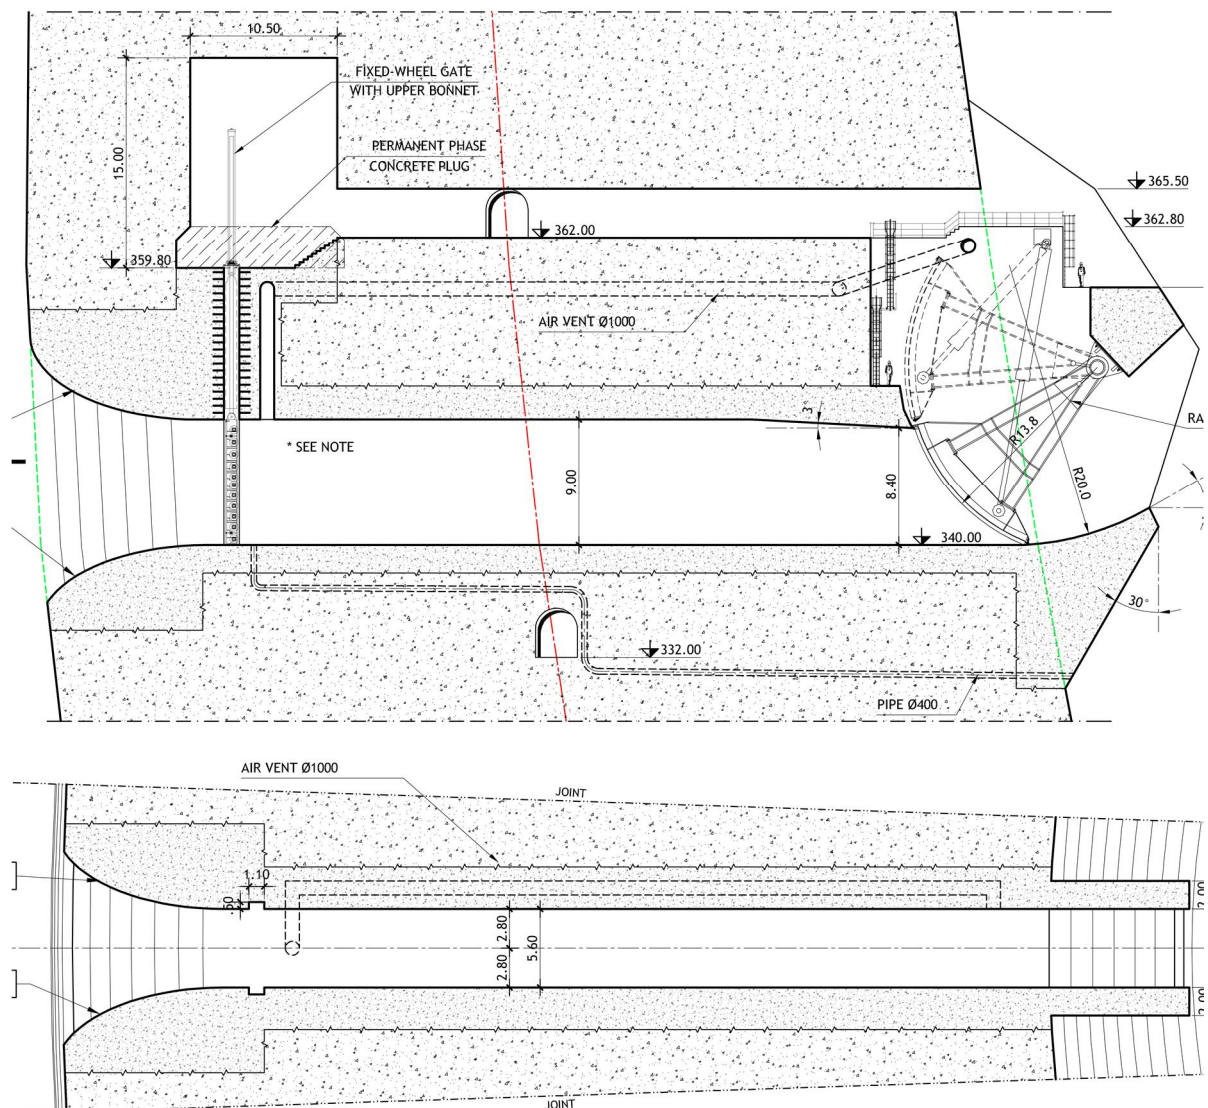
Low Level Outlet - Sluice design – Section and plan view
